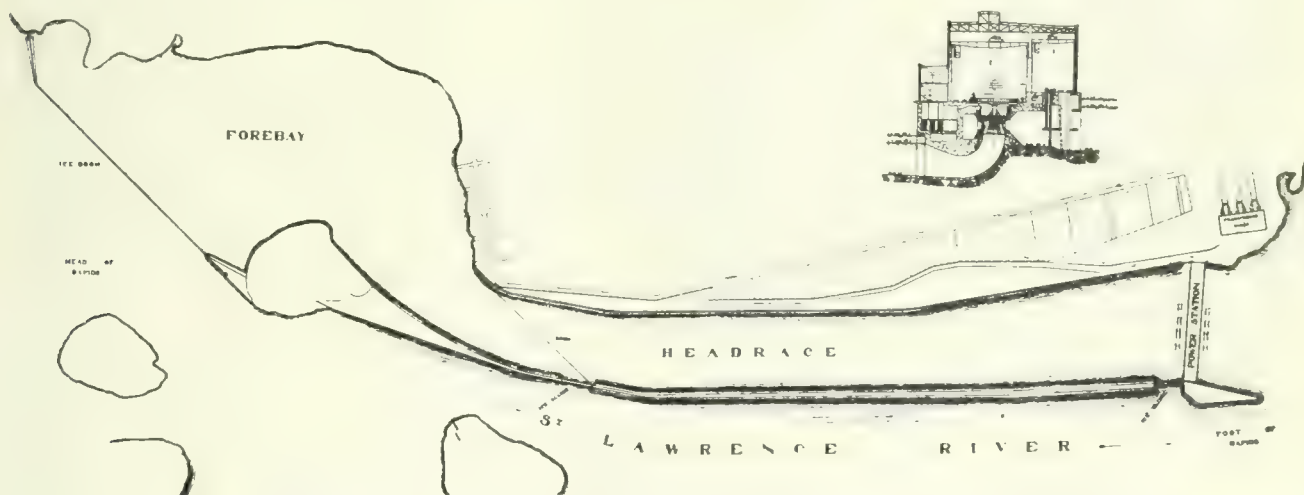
General Arrangement of Plant, and Cross Section of Power House.
